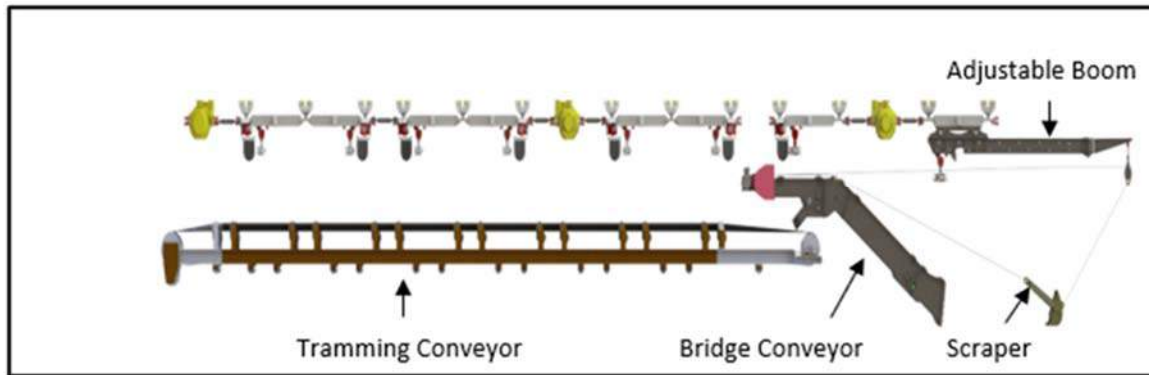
Mucking Machine – Monorail Mounted Slusher with Bridge Conveyor and Tramming Conveyor
